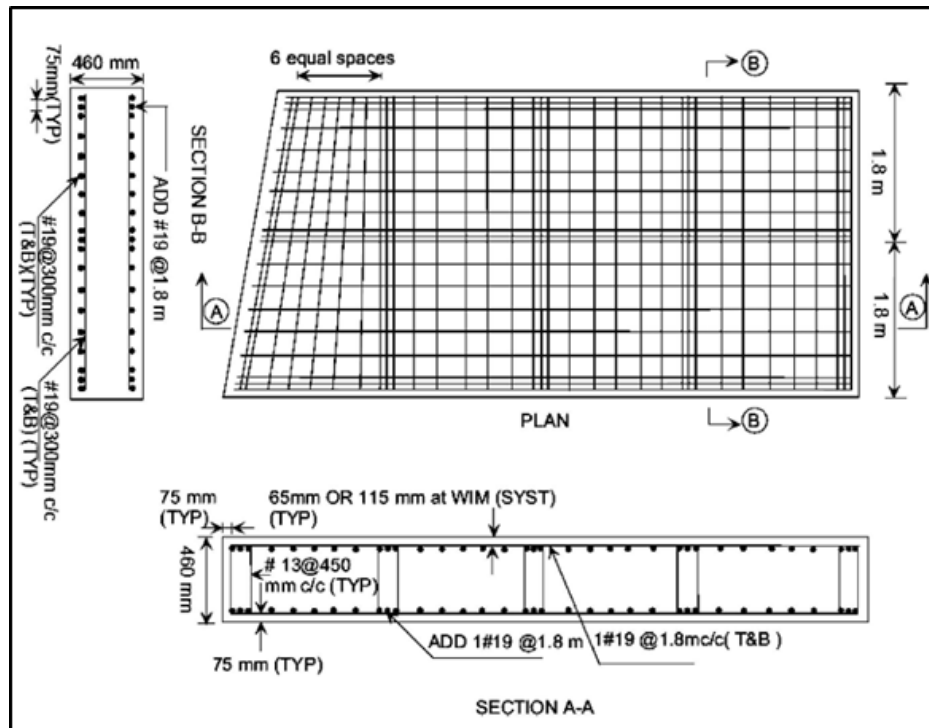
Reinforcement Details of an Embedded Beam (EB) Approach Slab (Nassif et al. 2009)
